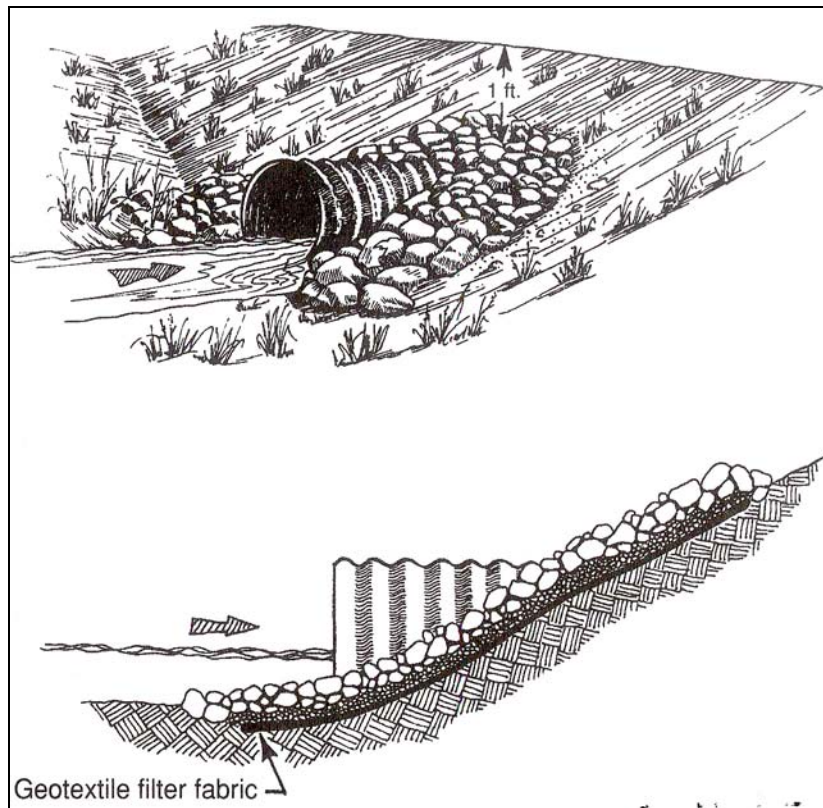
Culvert Installation Without Change in Stream Bottom Elevation.
